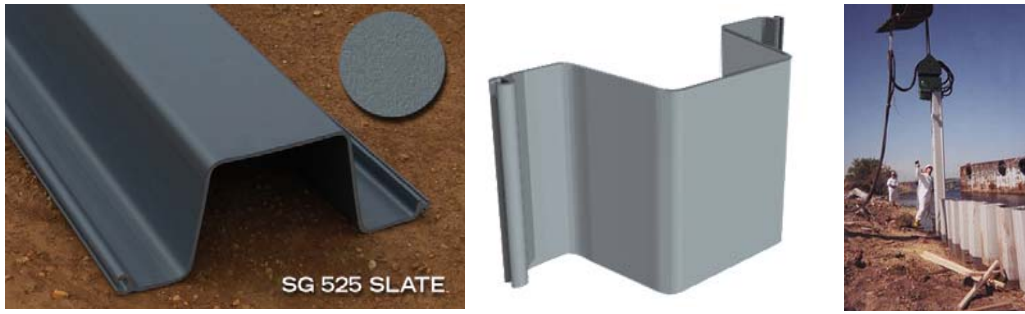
Typical sheet piles that will be used in Fullmoon Resort (0.609m wide). The sheet piles will be driven by vibration method (image on the left).
